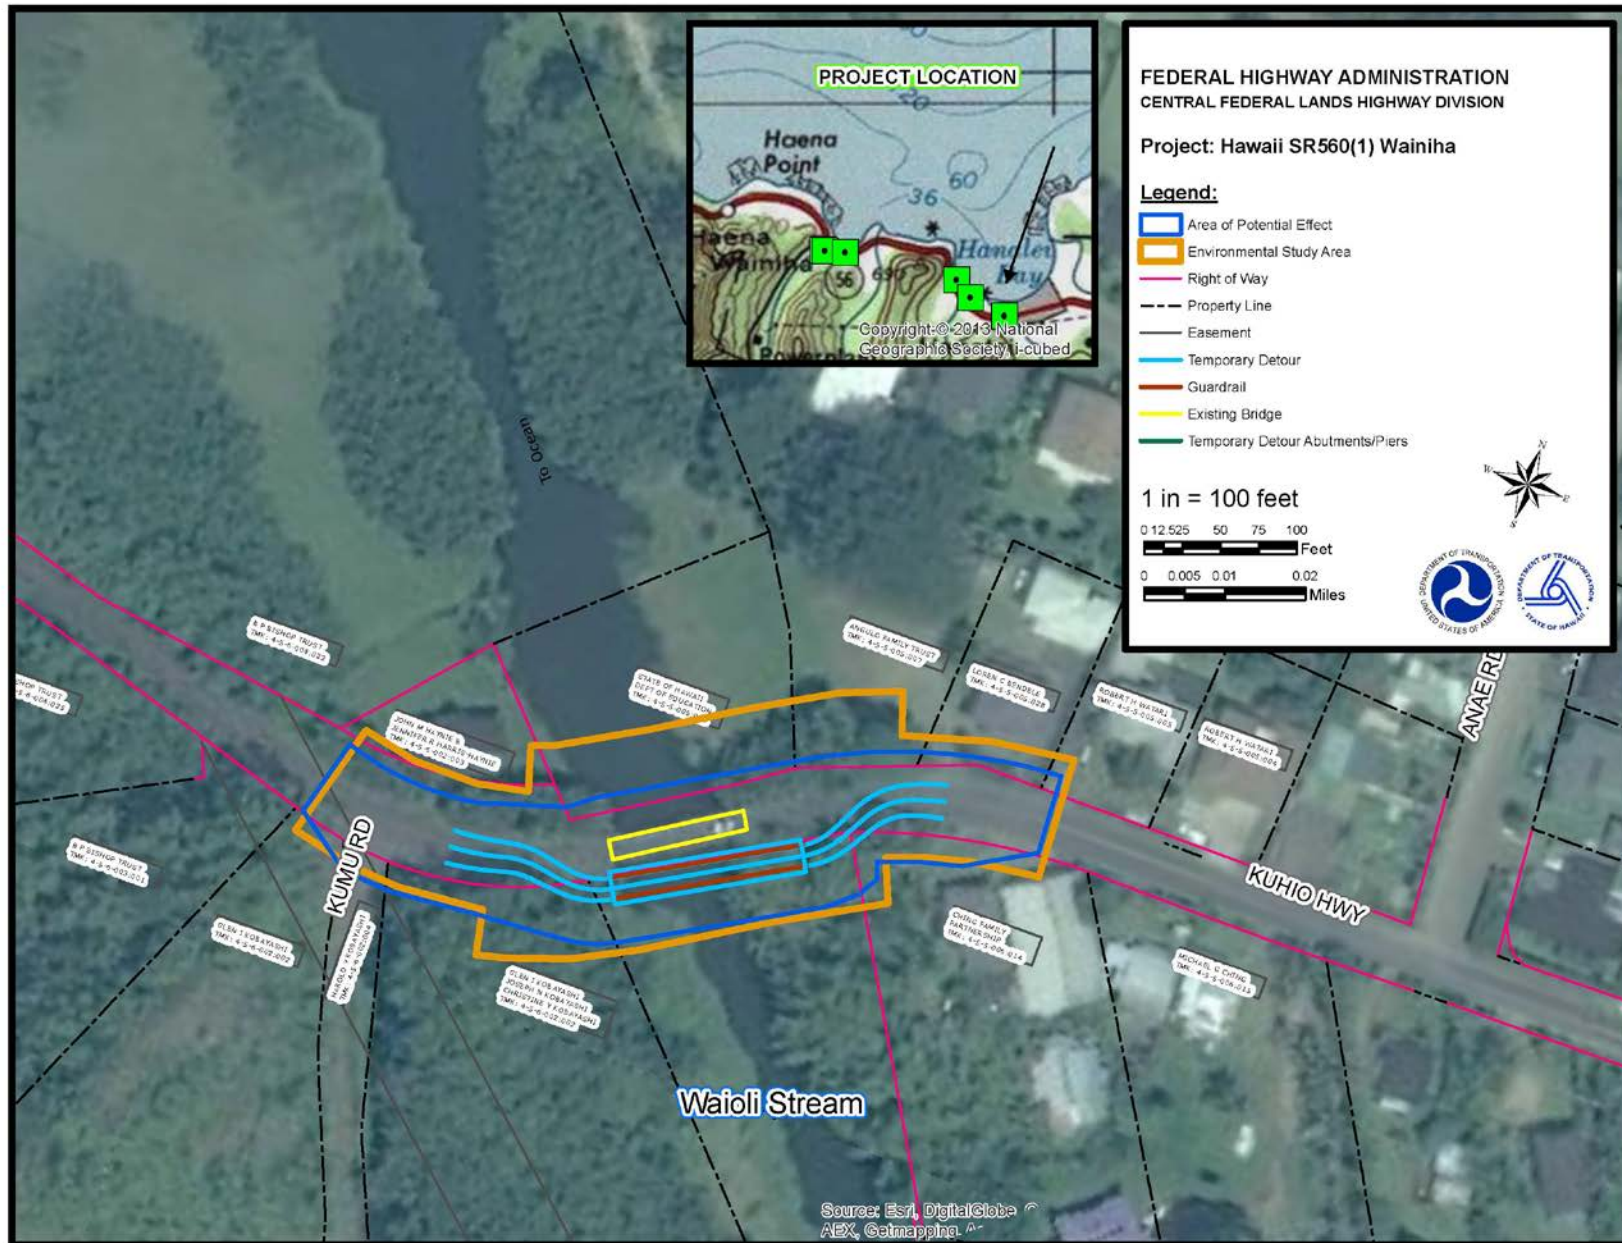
Approximate Location of Temporary Bridge at Waioli Bridge
